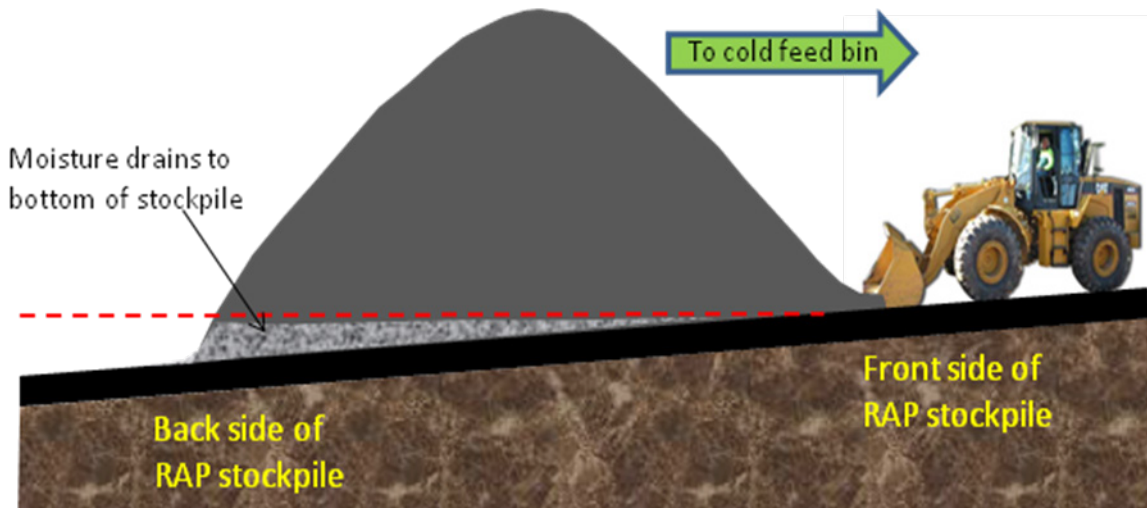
Illustration of Paved, Sloped Surface under RAP Stockpiles.
